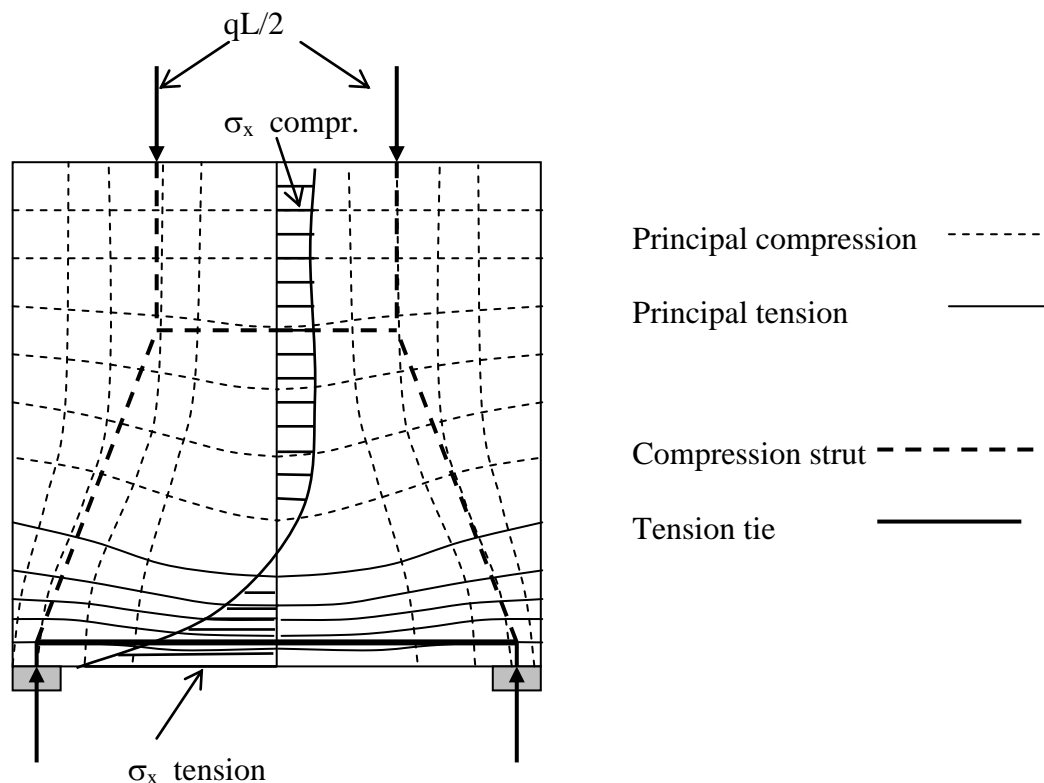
Strut-and-tie model for simply supported wall beam
